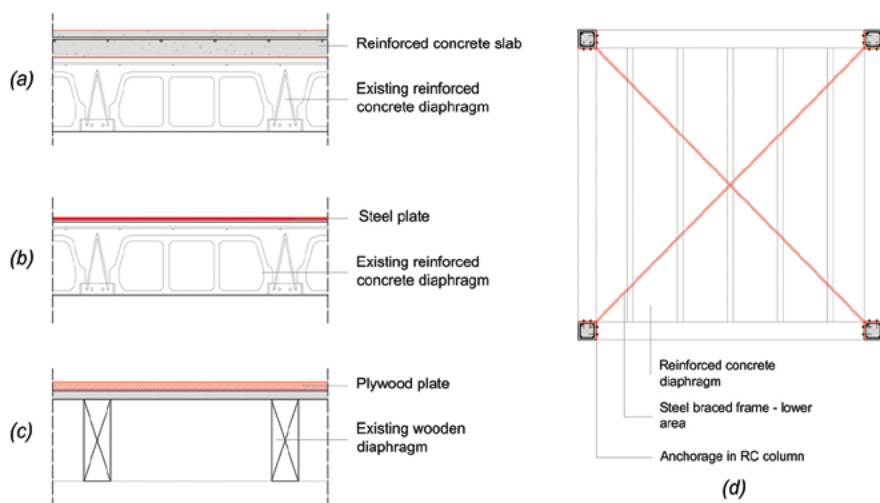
Horizontal diaphragm stiffening systems: a) Reinforced concrete slab on existing slab; b) Steel plate on existing slab; c) Thickness increase by means of plywood layer (Wooden slab); d) Bracing under existing slab.
